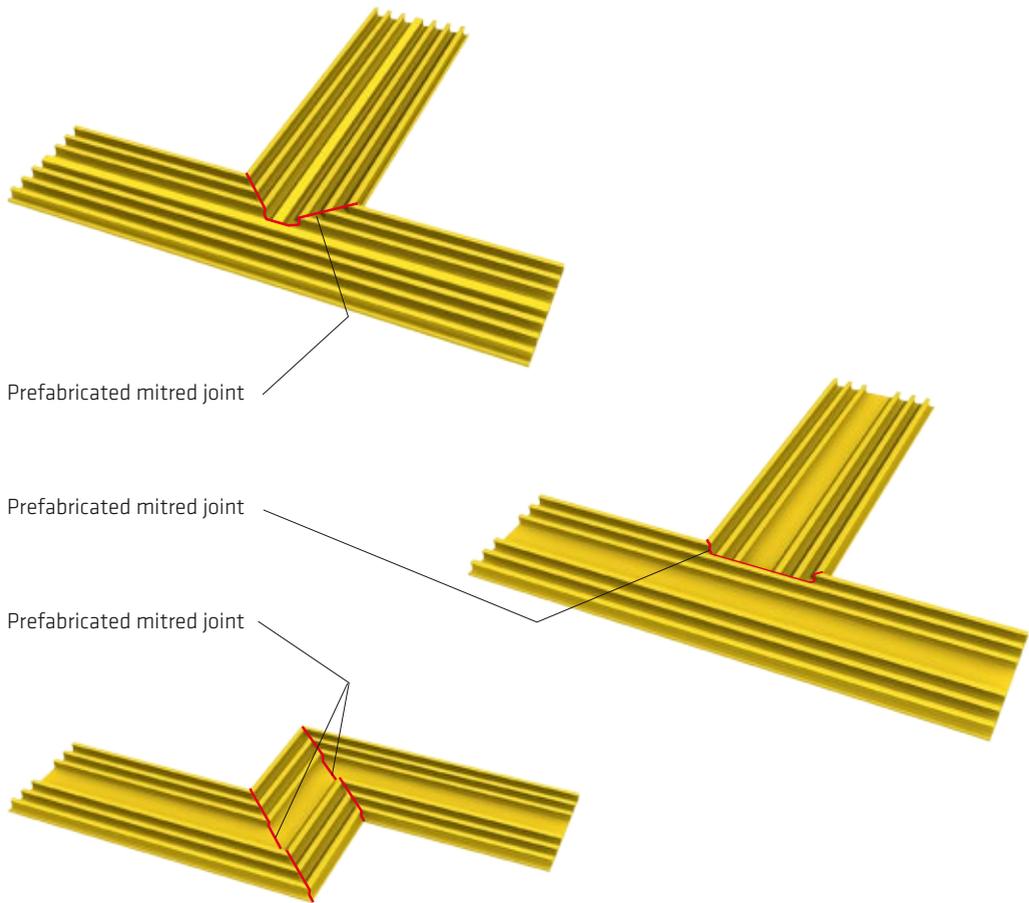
Examples of correctly welded waterbar butt joints [8]
